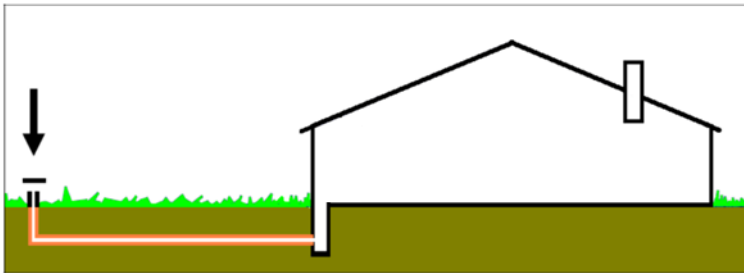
Schematic cross section of underground tube ventilation (@WUR)
